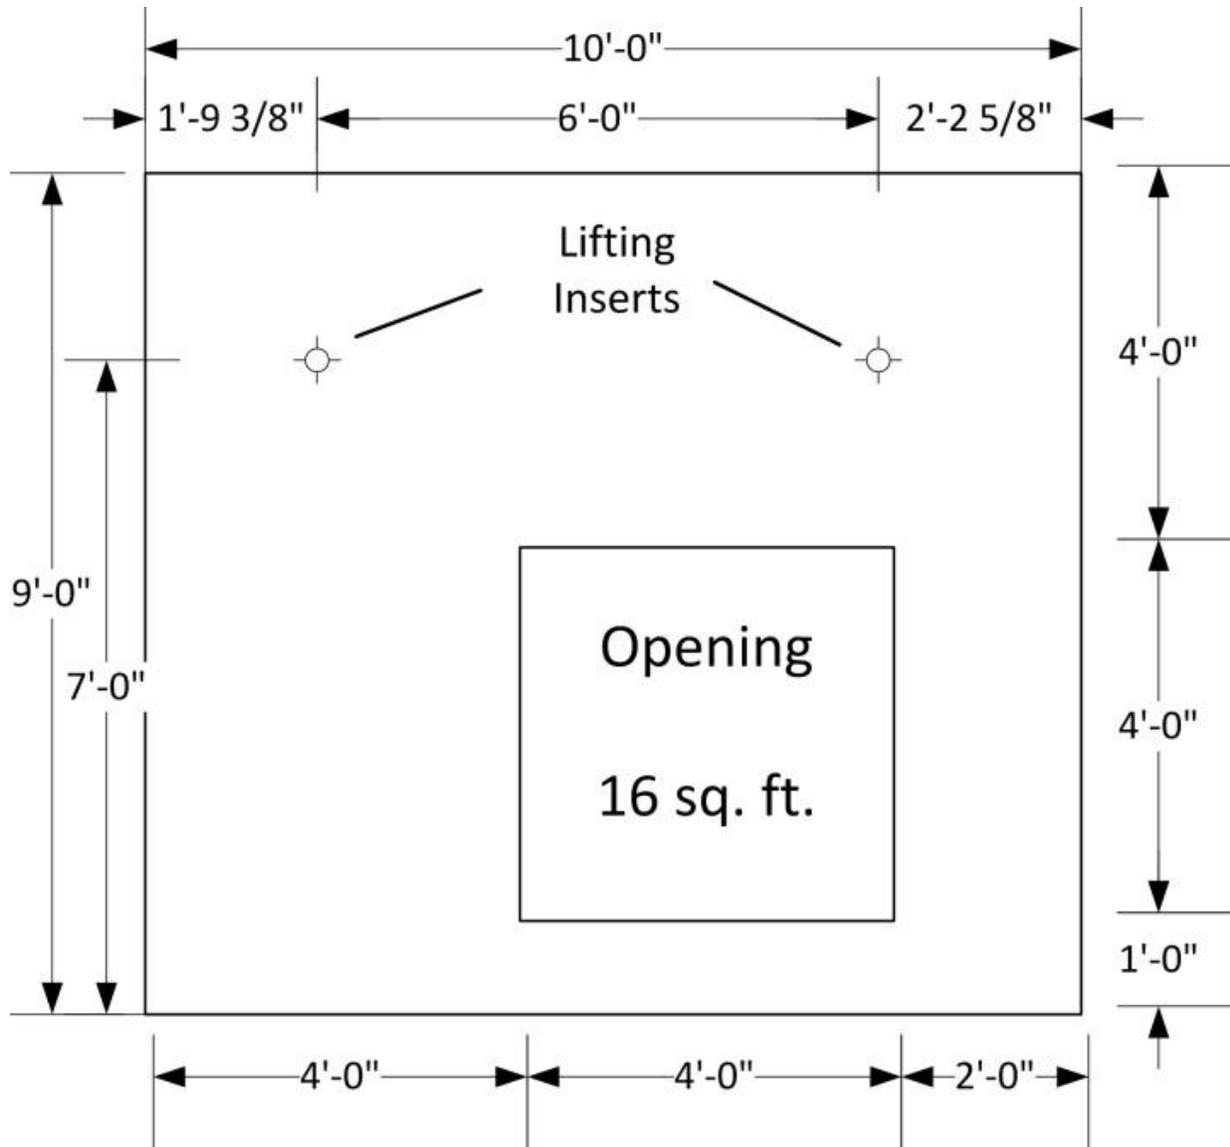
Tilt-up panel dimensions (drawing courtesy of Adel Alsaffar)
